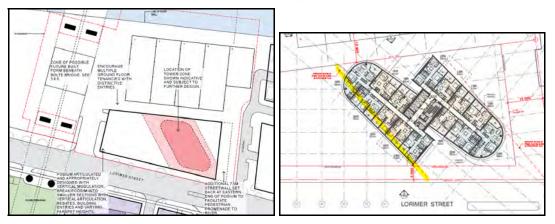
Location of tower on podium from the Development Plan compared to the proposed 'S' shape tower form.
